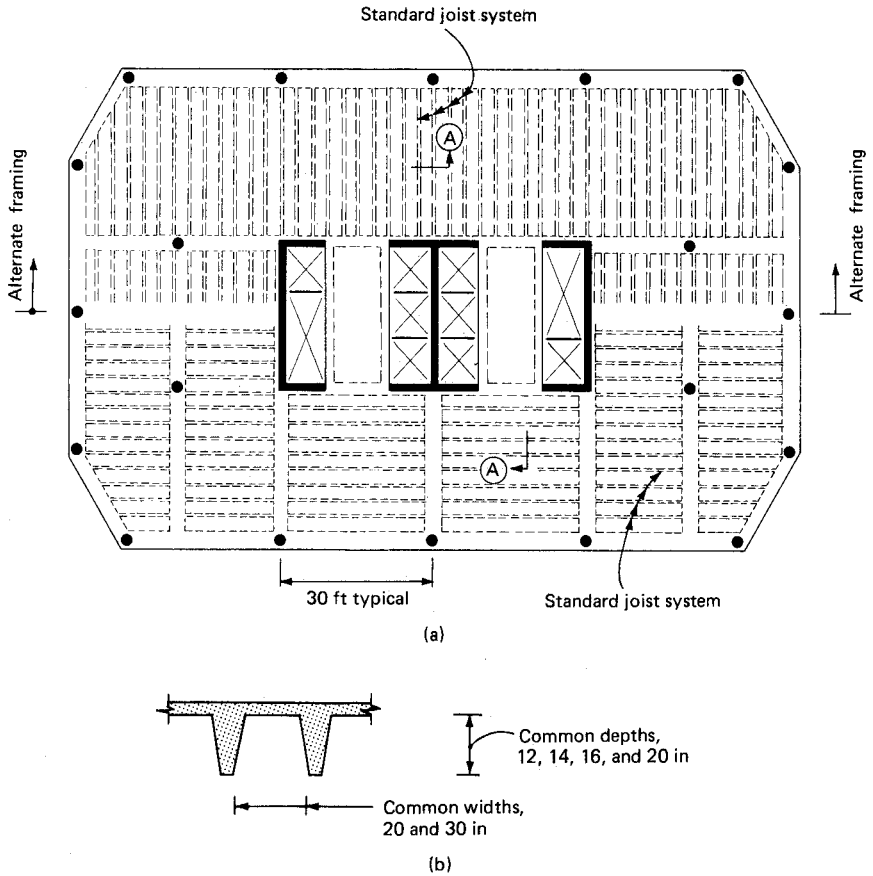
One-way joist system. (a) Building plan; (b) section A.
